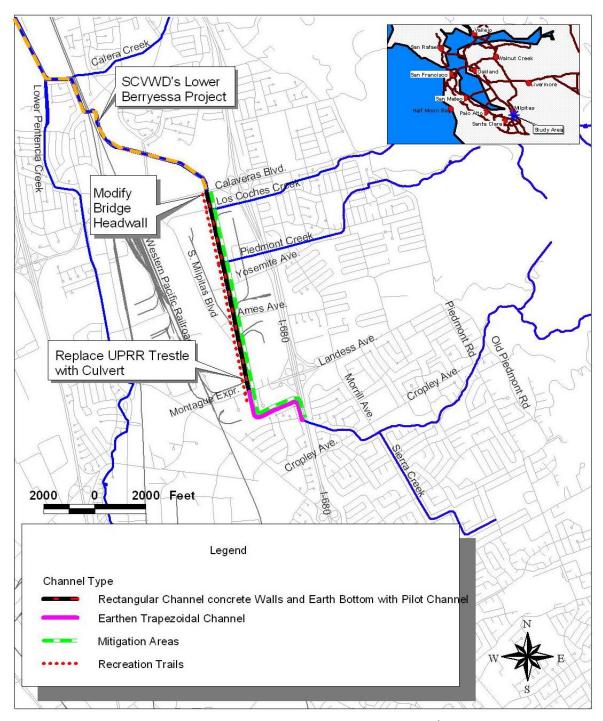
Alternative 4 – Earthen and Walled Terraced Channel (Highway 680 to Calaveras Boulevard)
